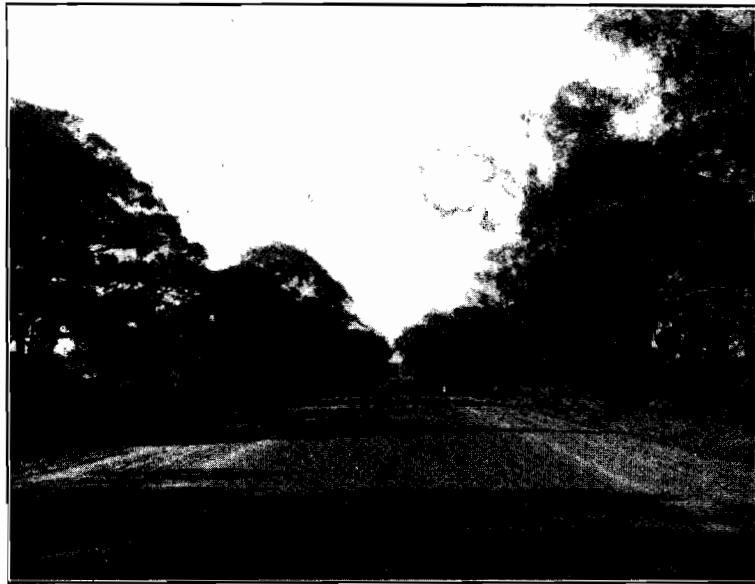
Section of South Gippsland Highway reconstructed between Dandenong and Lang Lang.
